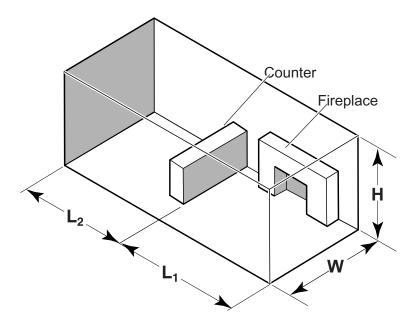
Example of a Large Room with 1/2 Wall Divider
